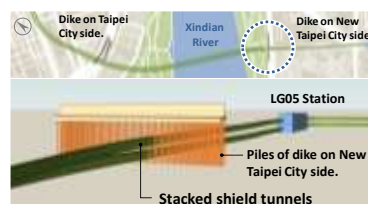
The position of stacked shield tunnels conflict with dike piles in original plan
